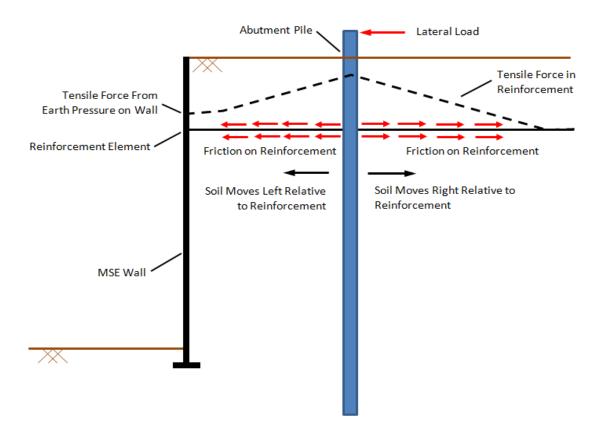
Interaction of soil and wall reinforcement for a laterally loaded pile behind an MSE wall (Hatch 2014).
